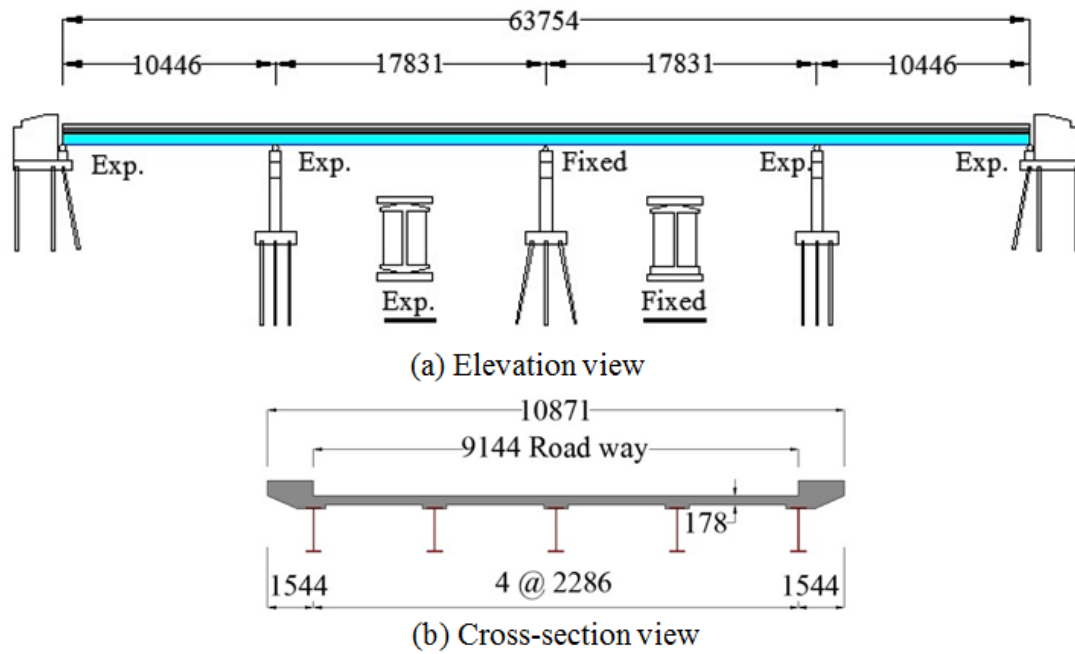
Plan drawing of the highway bridge from which the steel bearings were salvaged with all dimensions given in mm
